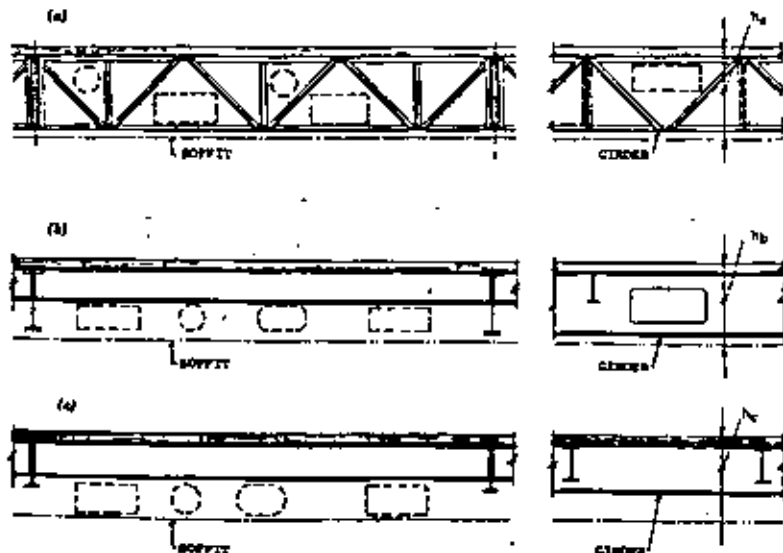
Ductwork, piping, and wiring in floor structures: (a) Latticed structures; (b) Plate girders with holes; (c) Ductwork, piping, and wiring suspended under floor structure
